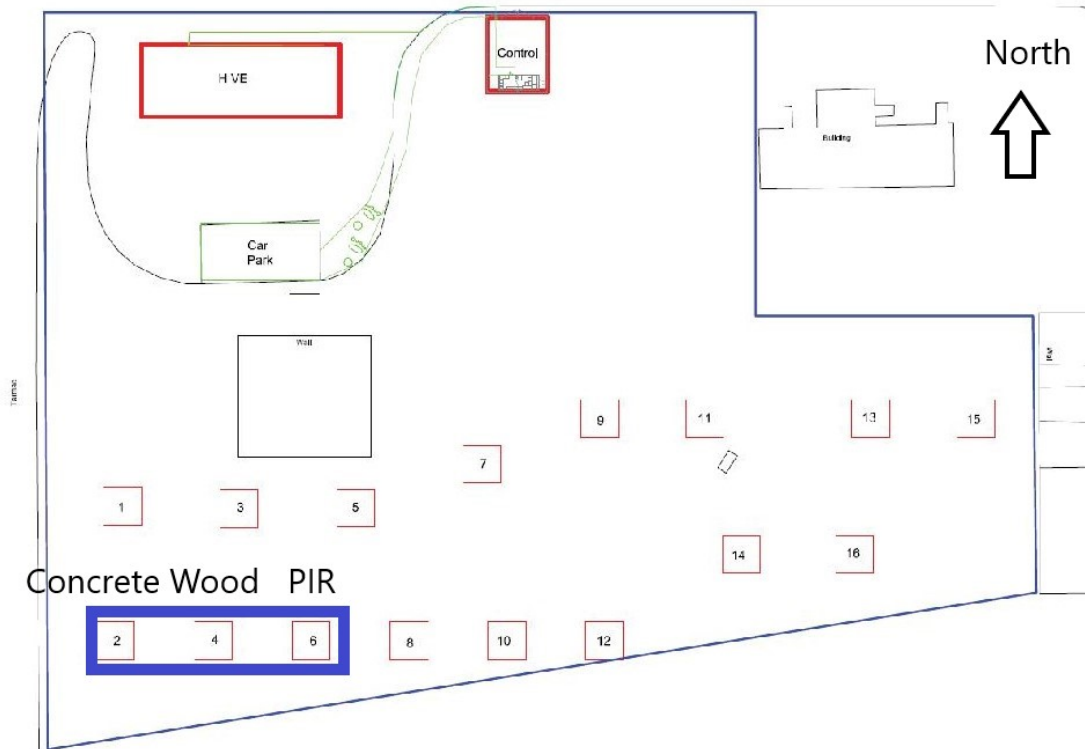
Plan of the BRP and the location of the three testing rooms
